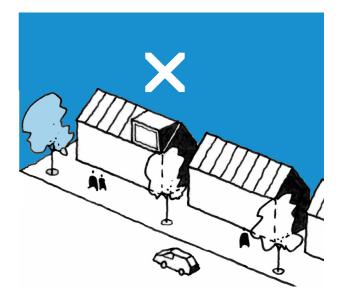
Dormer windows to the front of the building affect the streetscene and will not generally be acceptable
